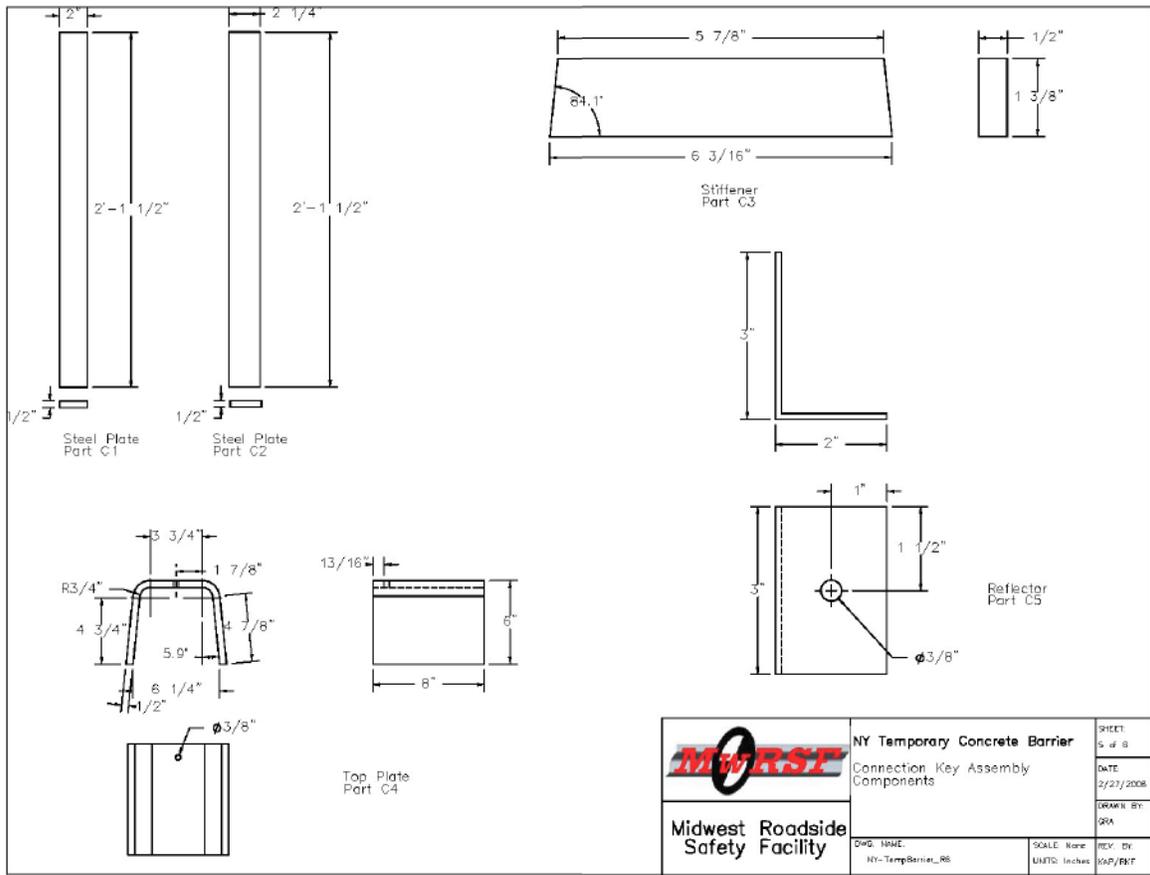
Connection Key Assembly Details (English), Test NYTCB-2
